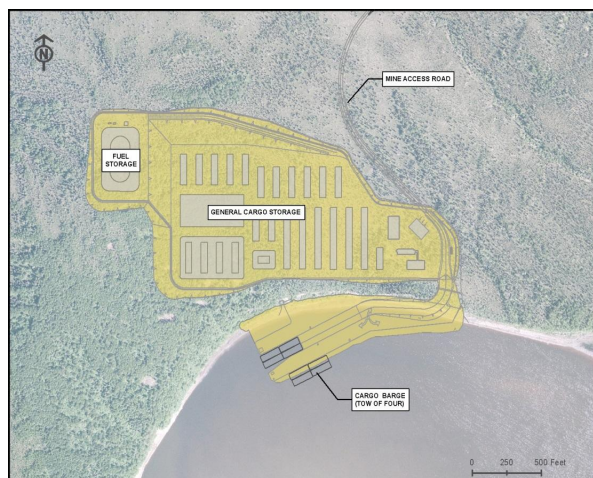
Alternative 4 Birch Tree Crossing Port Site
